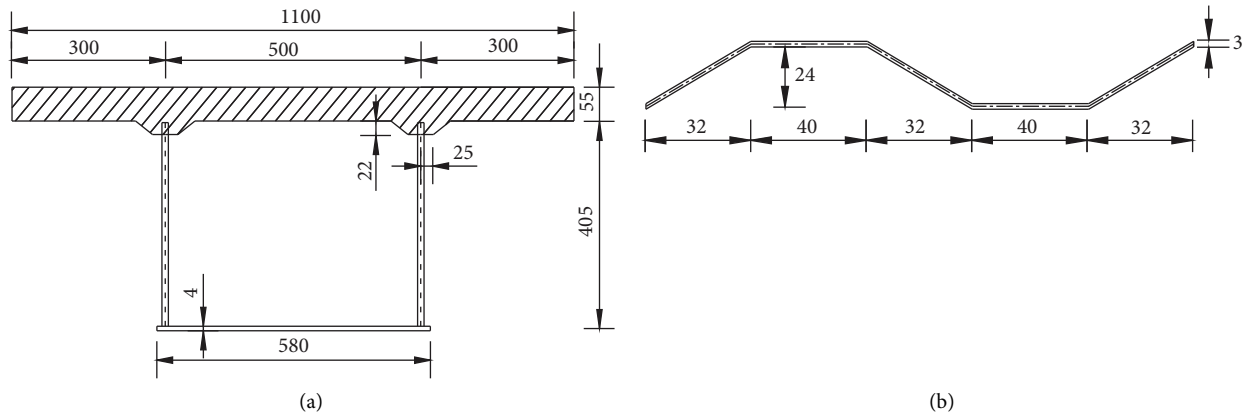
Section of the composite box girder and dimensions of the corrugated steel web (unit: mm). (a) Section size of composite box girder with CSWCB, (b) dimension of corrugated steel web.
